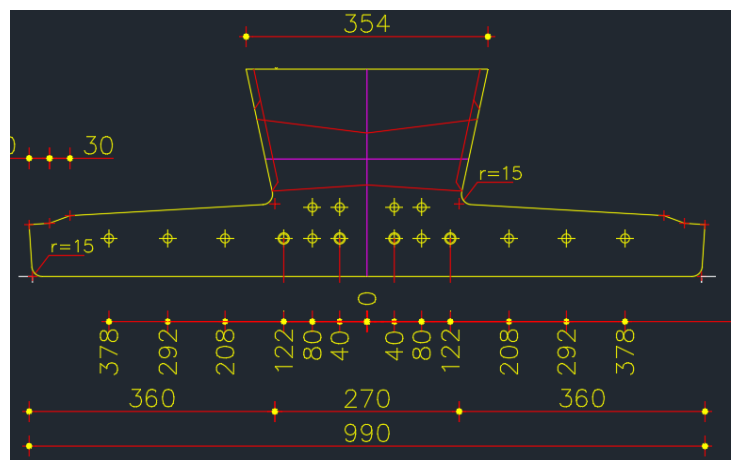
Cross section of the girder as visible in AutoCAD (units in mm)
